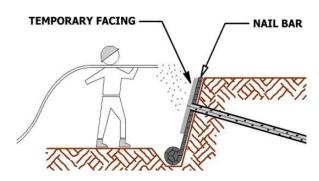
Installing the nails, injection grouting and shotcrete facing
